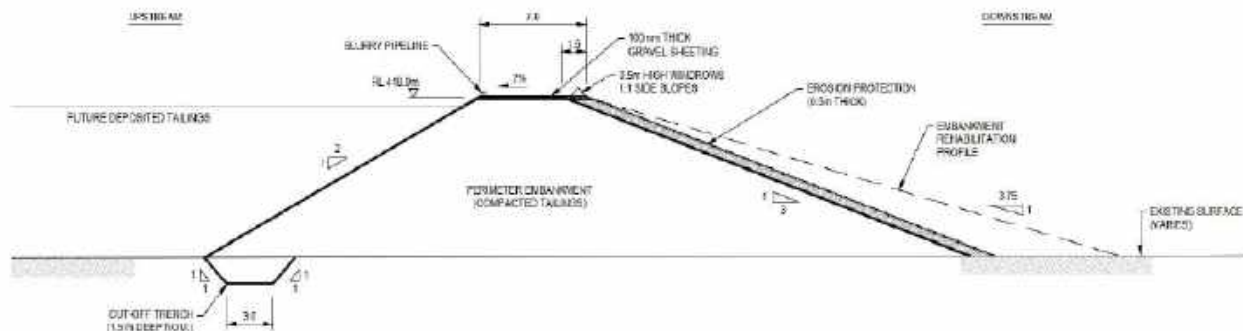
Typical Cross Section of TSF Cell 3 Perimeter Embankment
